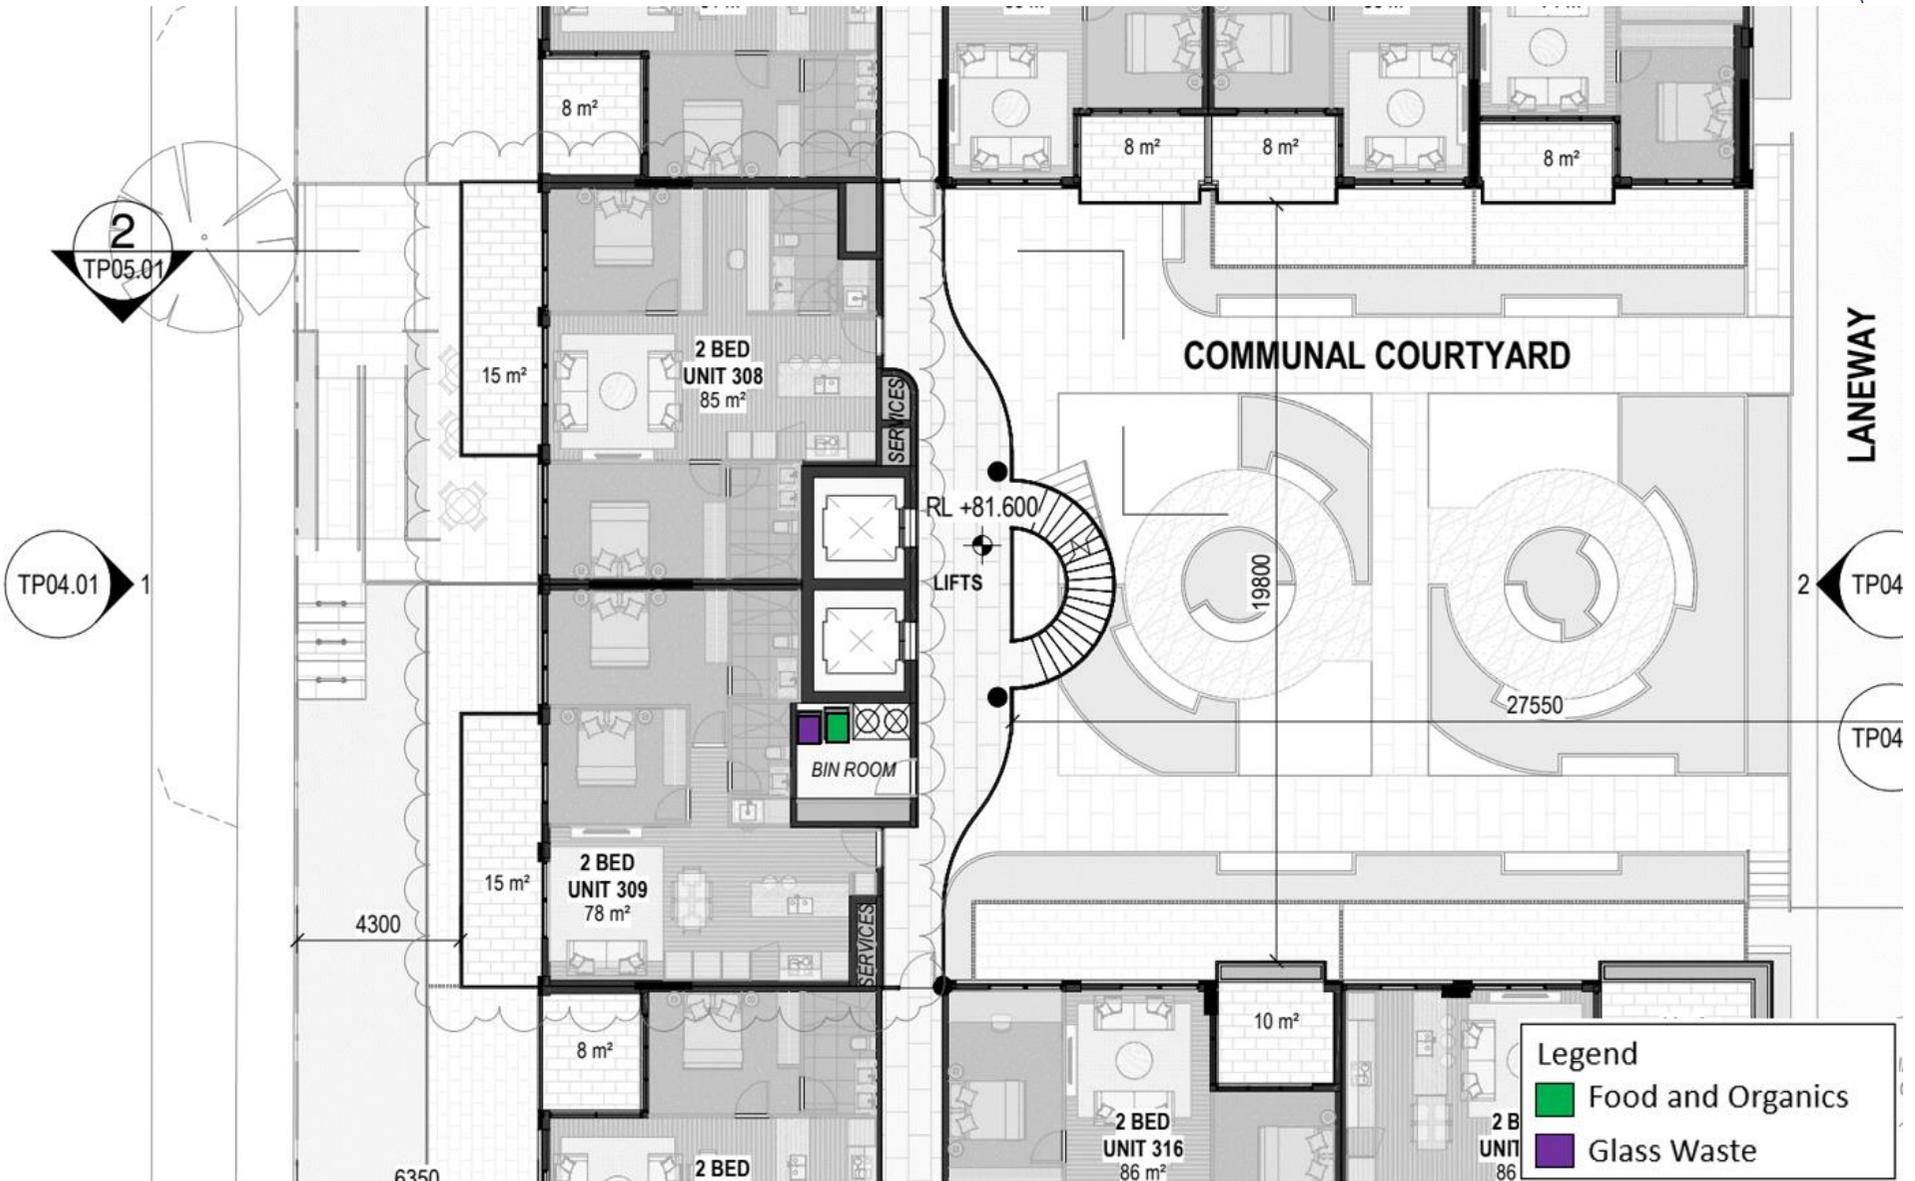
DEVELOPMENT PLAN – THIRD FLOOR BIN STORAGE AREA – FUTURE
